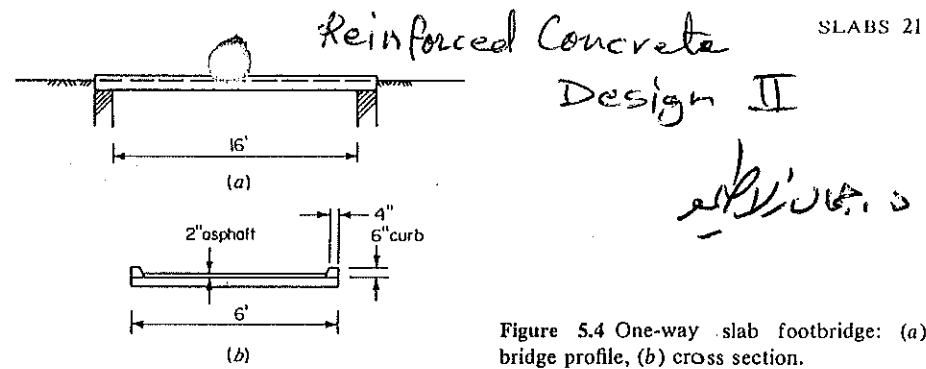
One-way slab footbridge: (a) bridge profile, (b) cross section.
